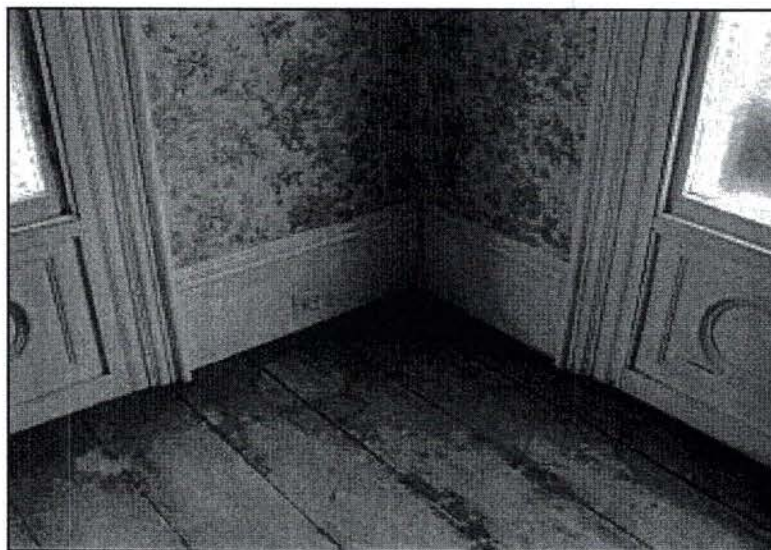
Detail of the northeastern corner of Room 100. The floors this room have been stained.
